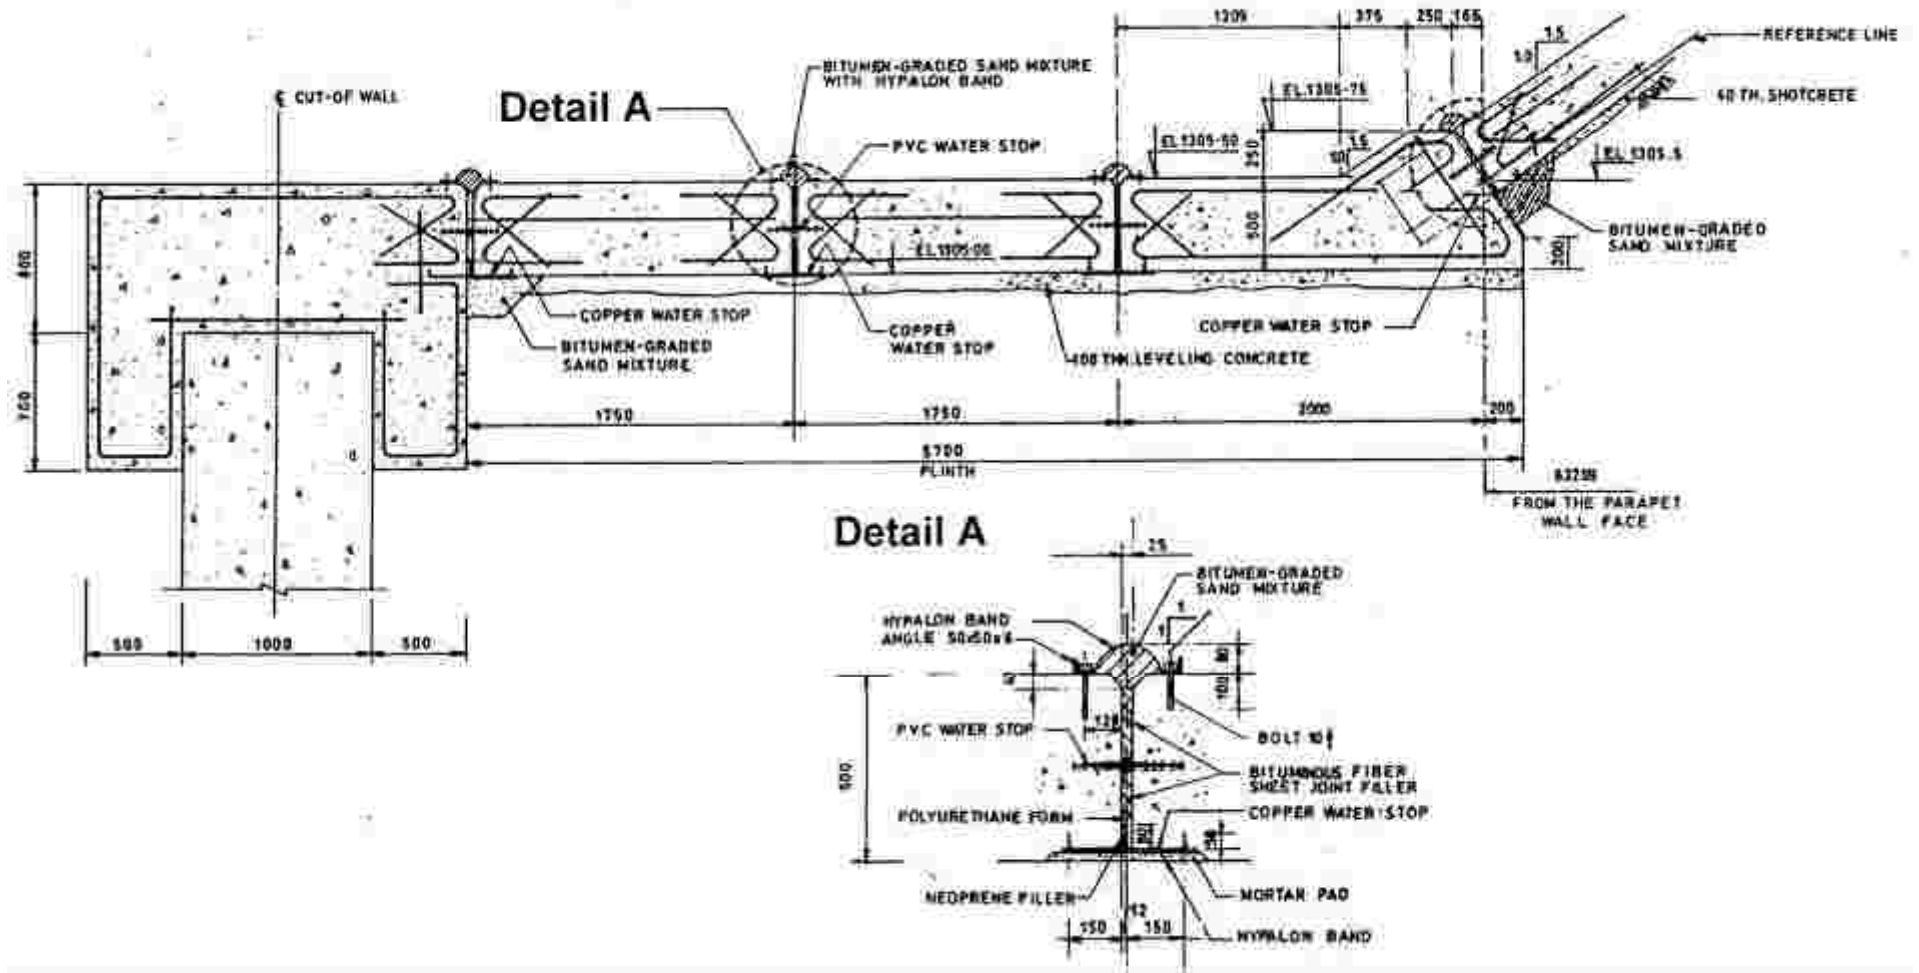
Connection of cutoff wall to plinth of concrete face rockfill dam
